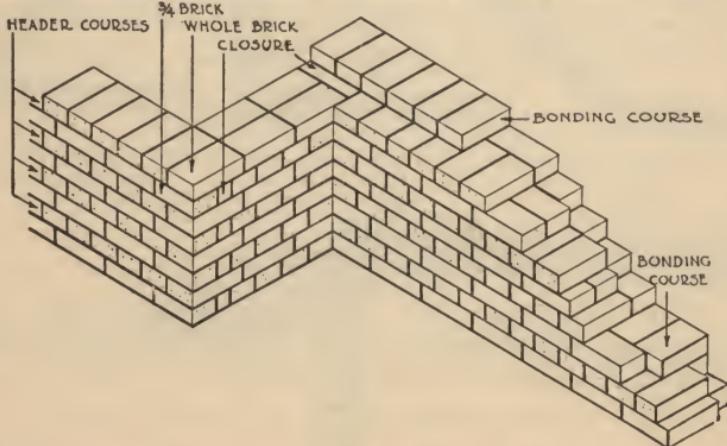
,229.—Outside and inside corners in English bond, 8 and 12 in. walls.
